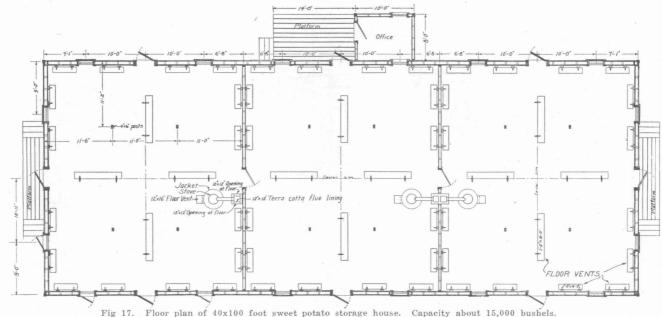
Floor plan of 40x100 foot sweet potato storage house. Capacity about 15,000 bushels.
